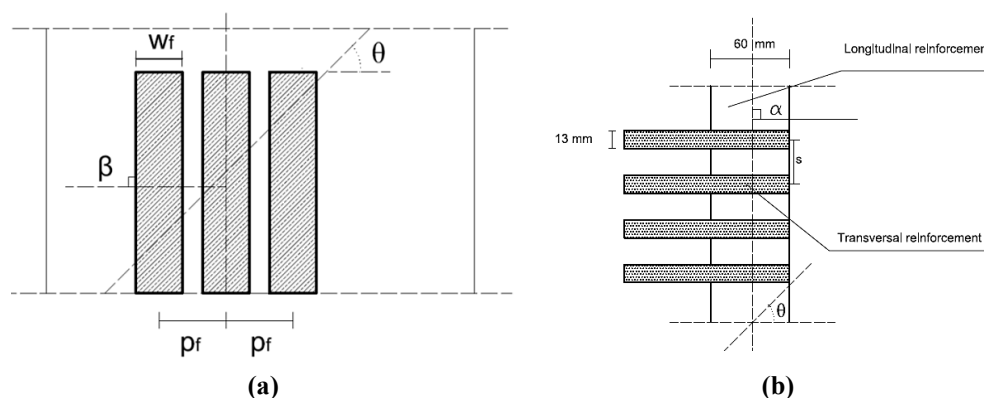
(a) CFW/SWF and (b) SJ reinforcing details.
